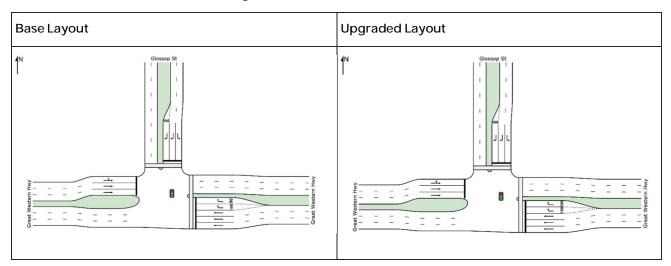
2031 with Links Road extension - Great Western Highway/Glossop Street
